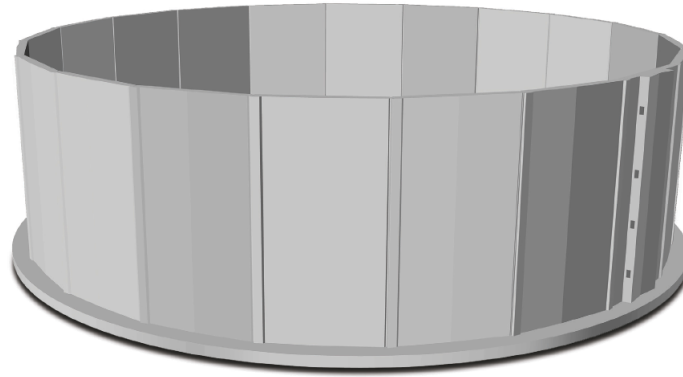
A concrete tank established from precast elements, Abetong (2015).
